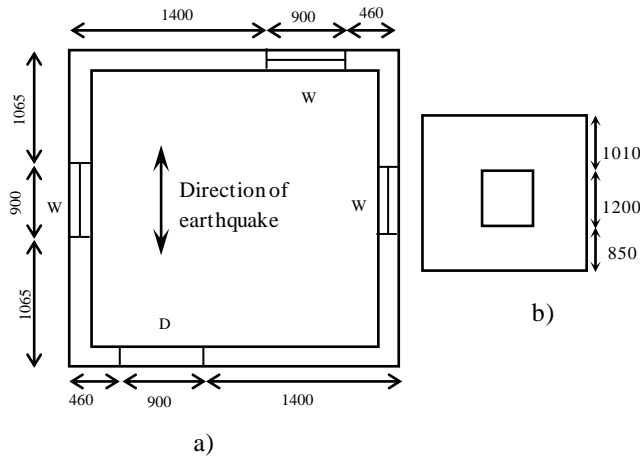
Geometry of a) Brick masonry building [7] b) in-plane walls
